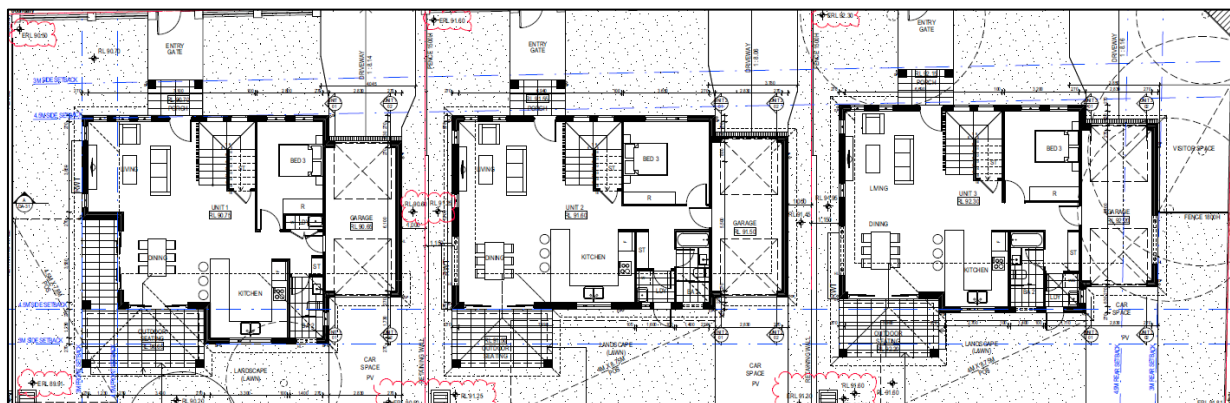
Ground floor plan of each dwelling showing that windows of habitable rooms are offset from each other.
